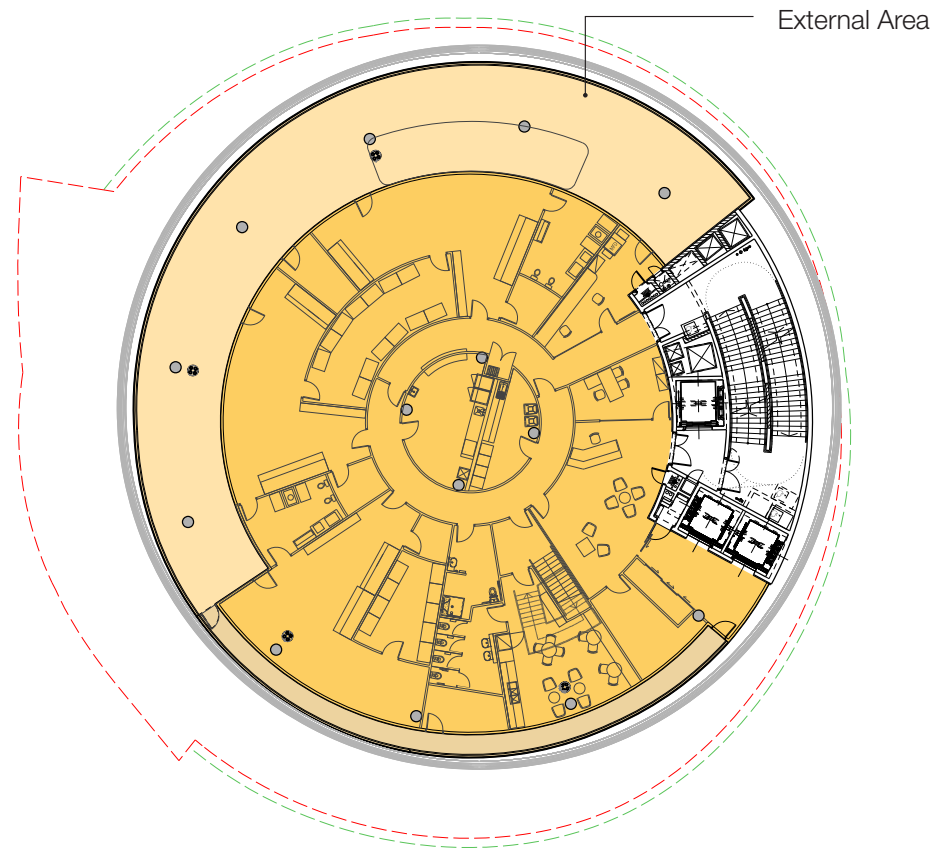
Proposed Level 3 Plan - child care layout
